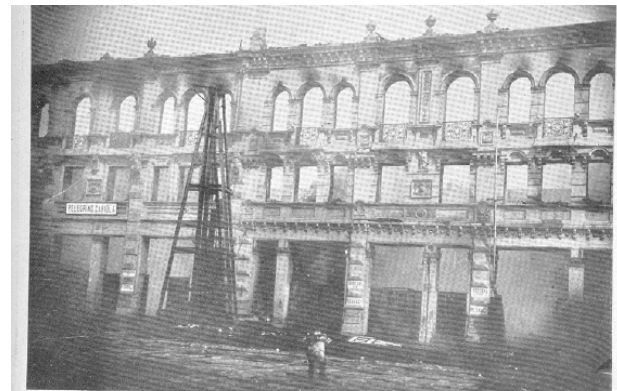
Fire damage of a good construction 3-storey building at a fill soil zone, showing no cracks by the 1906 earthquake. Blanco Street. (Hardy, 1906).
